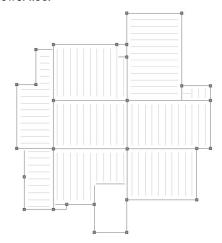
First Floor Structural System - diagram showing the proposed structural components of the first floor
